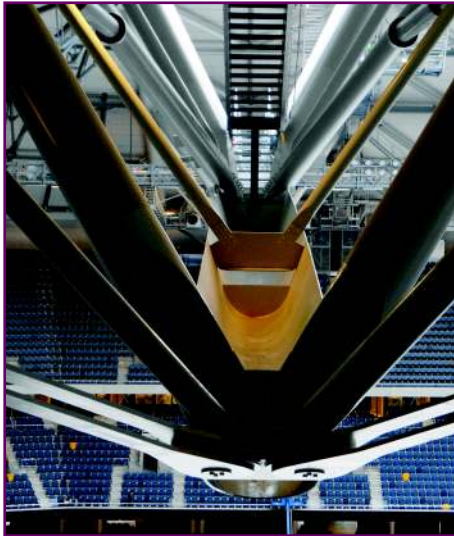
Connection detail of the primary truss bottom chord, Friends Arena Stockholm.
